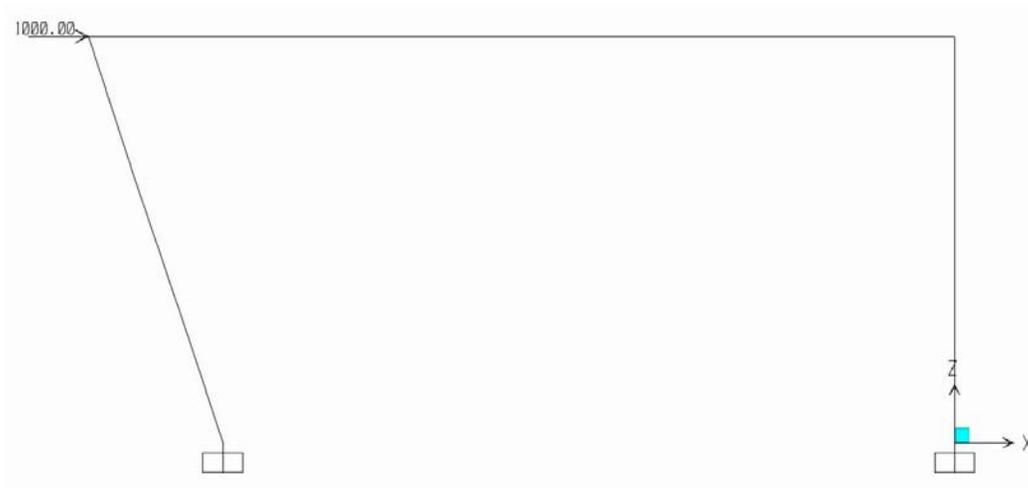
Pier 3 Transverse Loading Lateral 1
